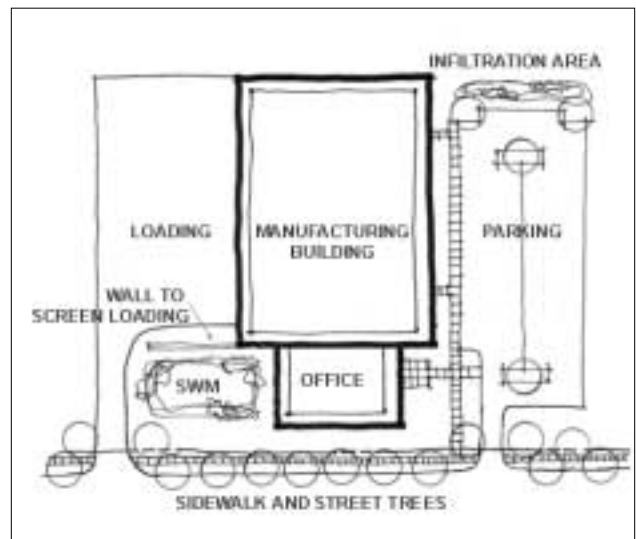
After. Building is converted to office and manufacturing uses, building and parking comply with CE setbacks, side entrance to building is oriented to roadway, number of driveways is reduced, some loading is converted to parking and loading is screened.
